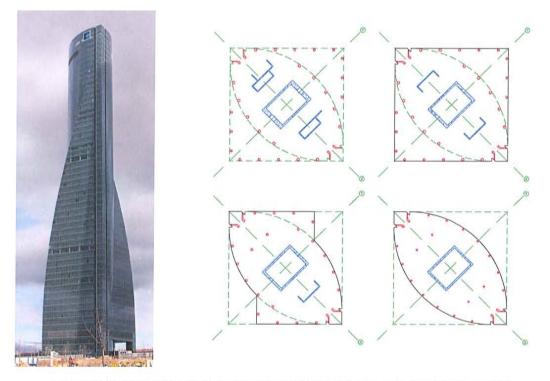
Torre Espacio with typical floor plan at basement, low-, mid- and high-rise section
